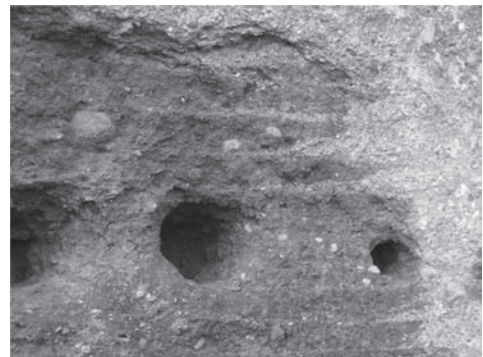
A detail of the crust that protects the earth mass of the wall. (Source: author).
